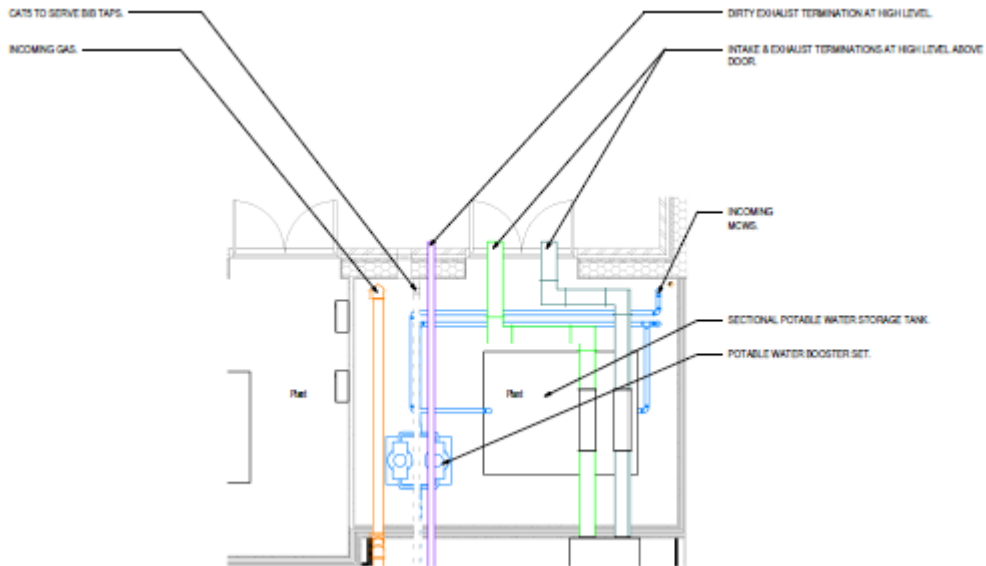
Ground Floor (20.9m²) Plantroom Layout – Turing House School
